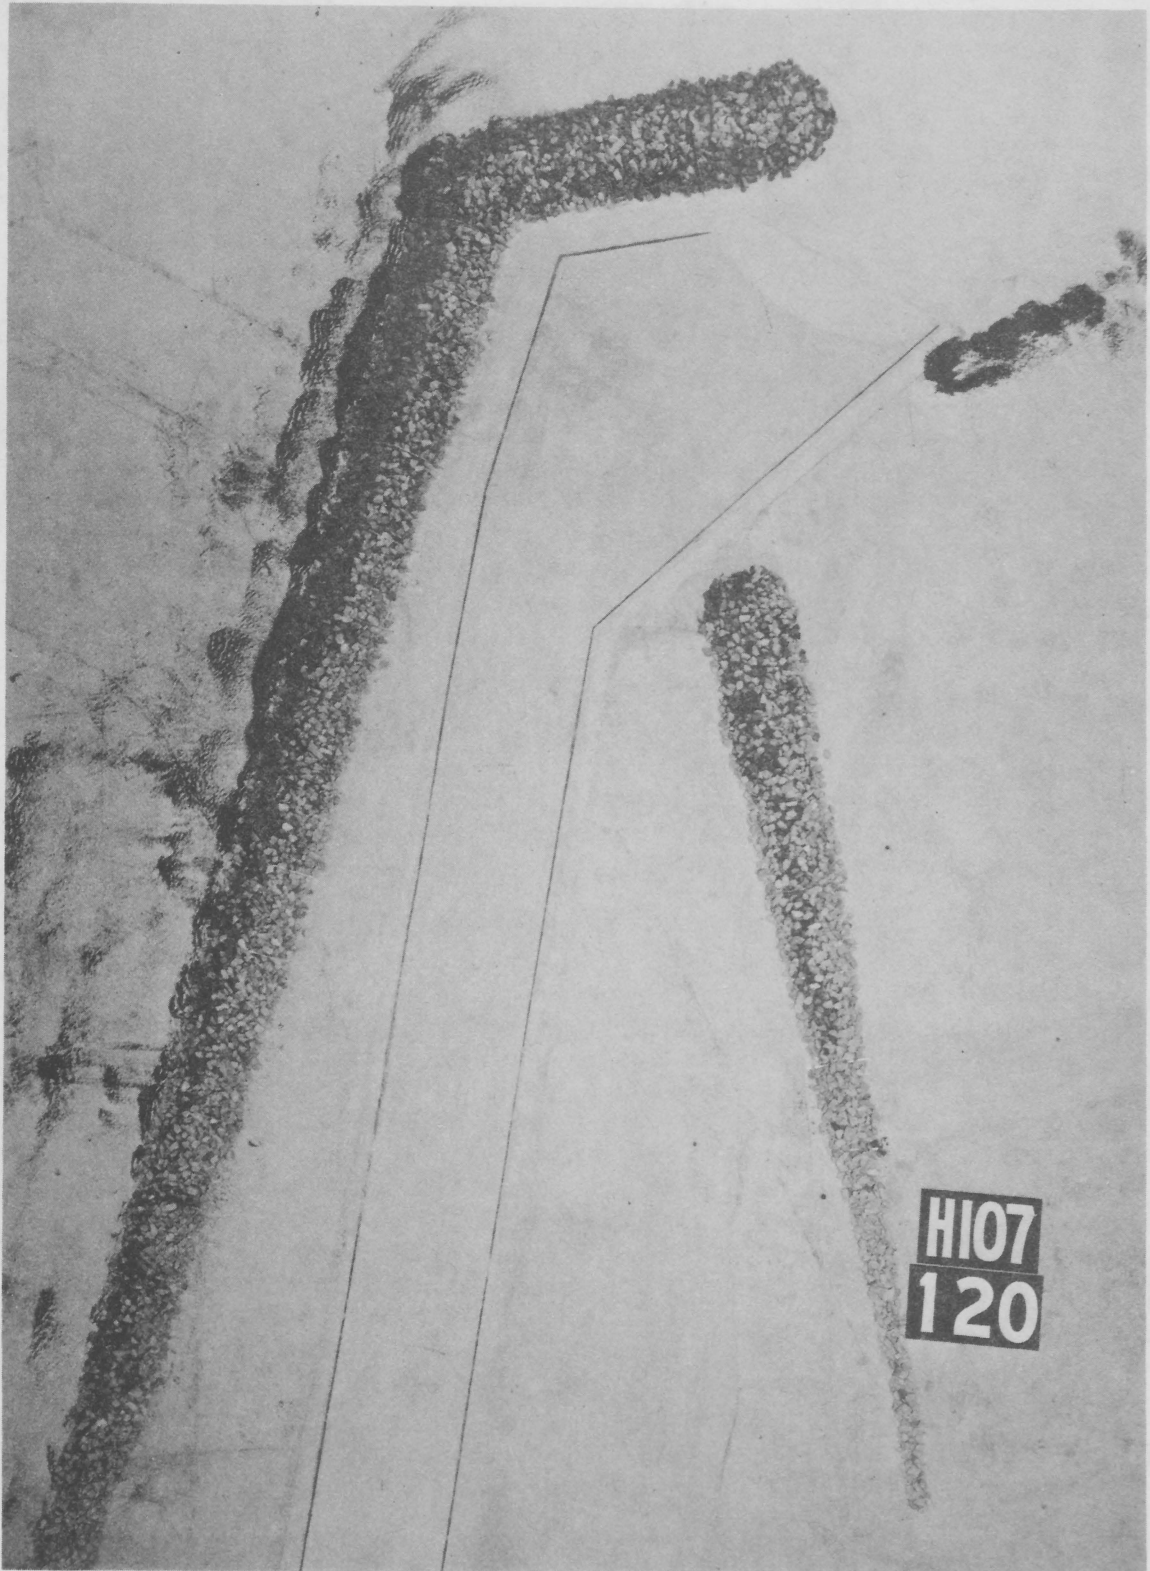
Typical shoaling pattern at Cattaraugus Creek for recommended plan of improvement.
